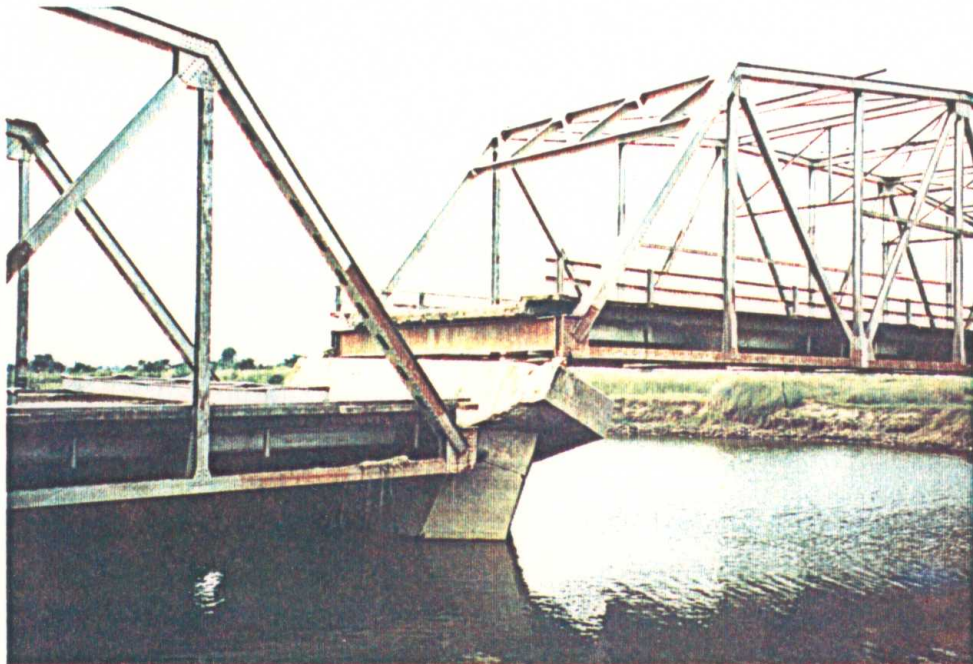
Failure mode of Carmen Bridge, intensive settlement and tilting of pier due to liquefaction.
